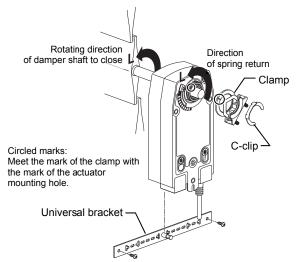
Temporary installation for min. 85 mm long damper shaft (counterclockwise rotation for closing)
